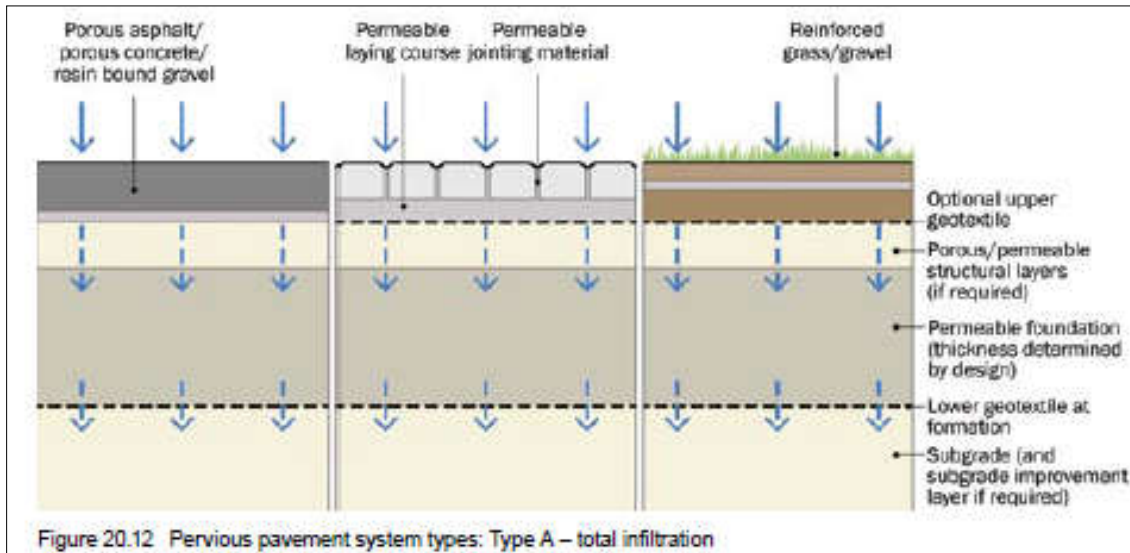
Typical Cross Section of an infiltration permeable paving (Extract from CIRA SuDs Manual)
